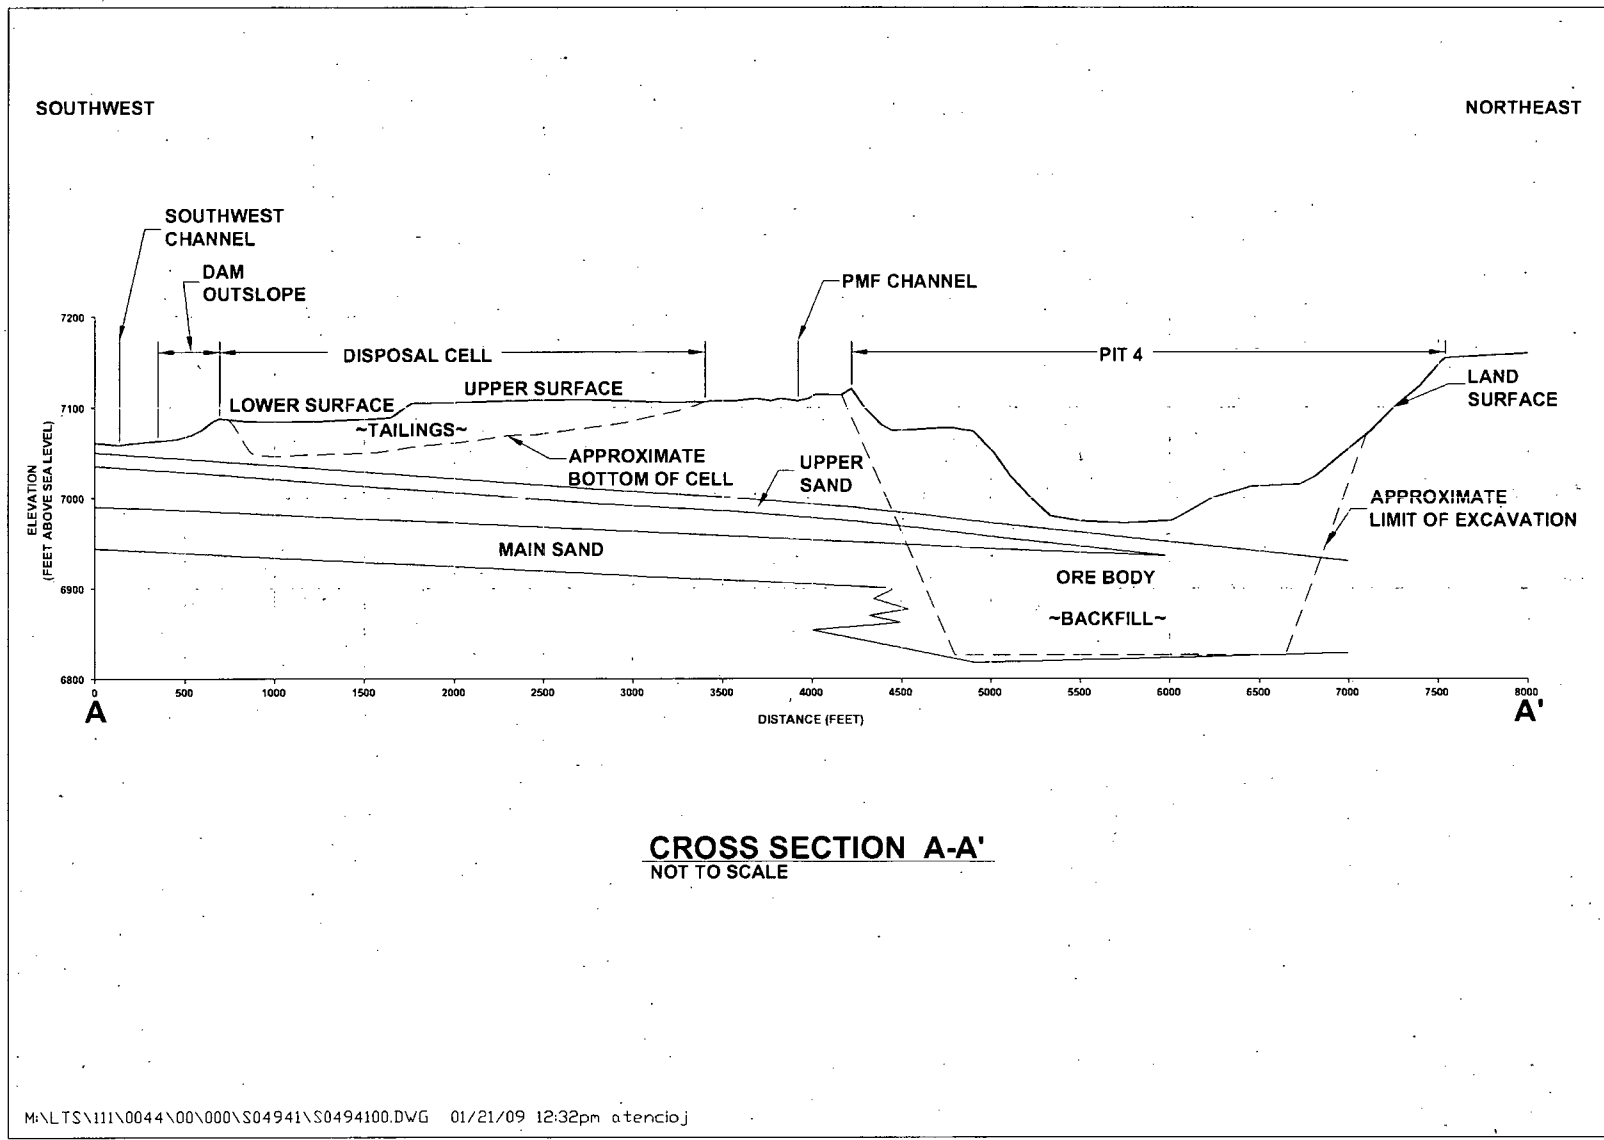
Cross Section A-A' of the Shirley Basin South, Wyoming, Disposal Site
